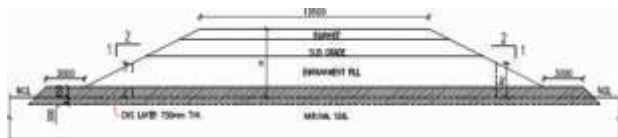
Typical Embankment section with complete replacement of CNS for full section
